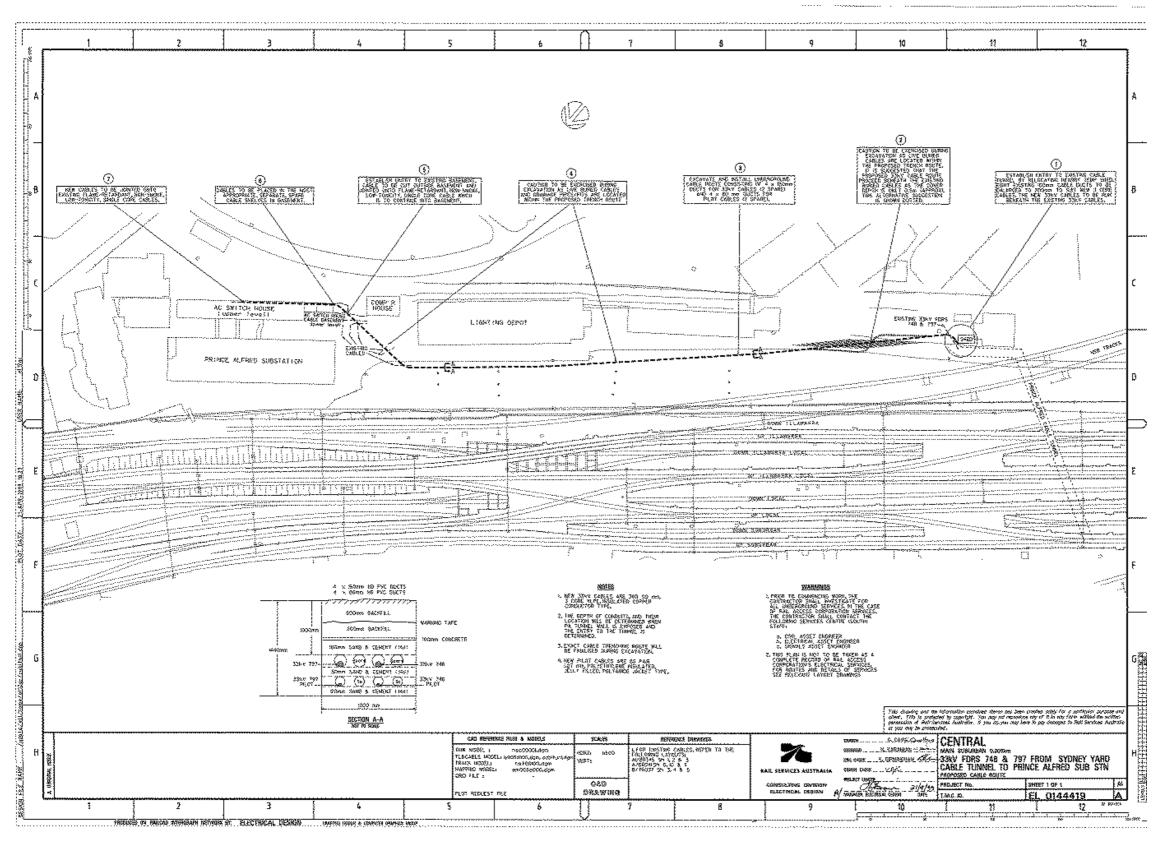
Cable Tunnel Plan for Prince Alfred Park Substation
